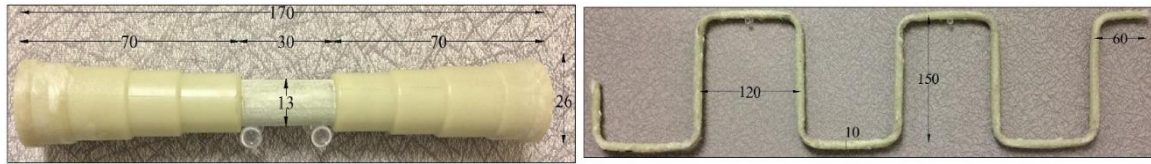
Details of shear reinforcement a) GFRP headed studs b) SC-GFRP corrugated bars.
